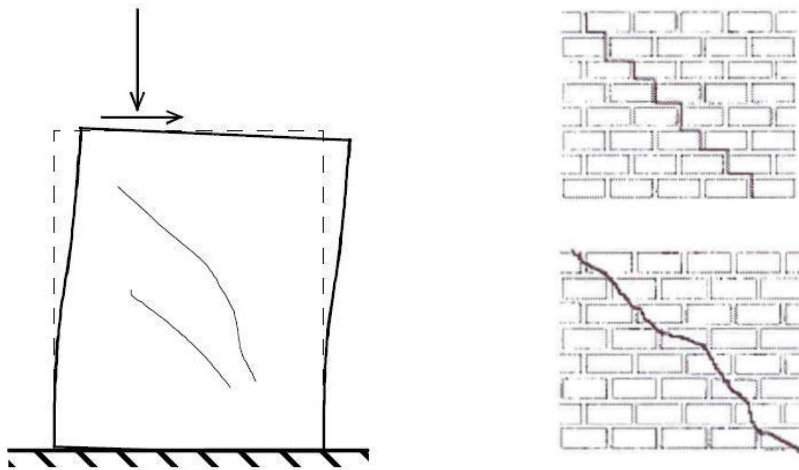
Shear failure with diagonal shear crack (left), step shape crack or crack passing through mortar joints and units (right) (from Macchi and Magenes, 2002).
